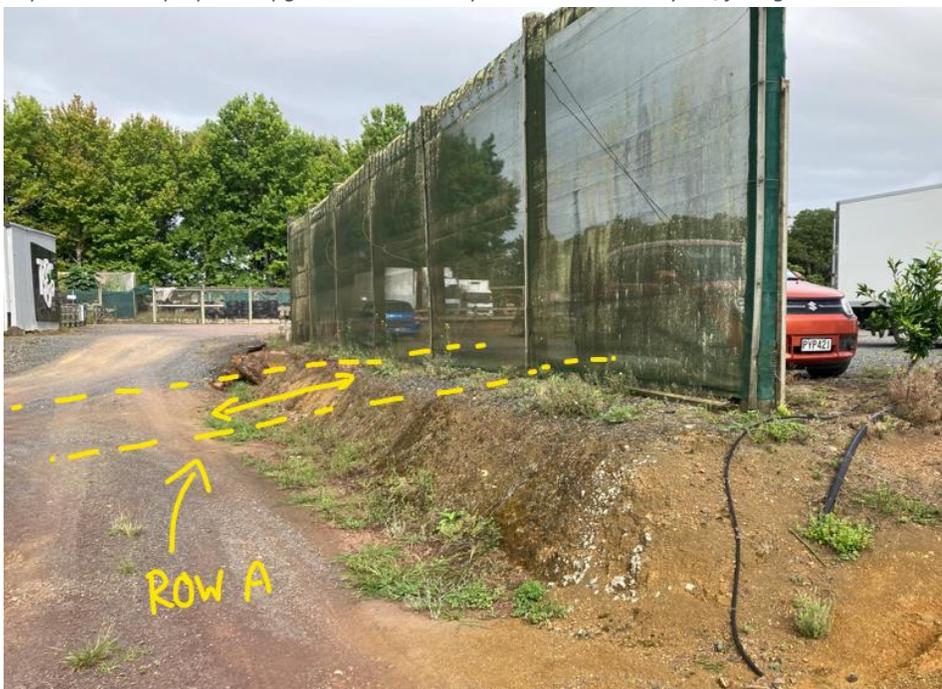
Existing metallated yard with proposed RoW A and G, facing south west
